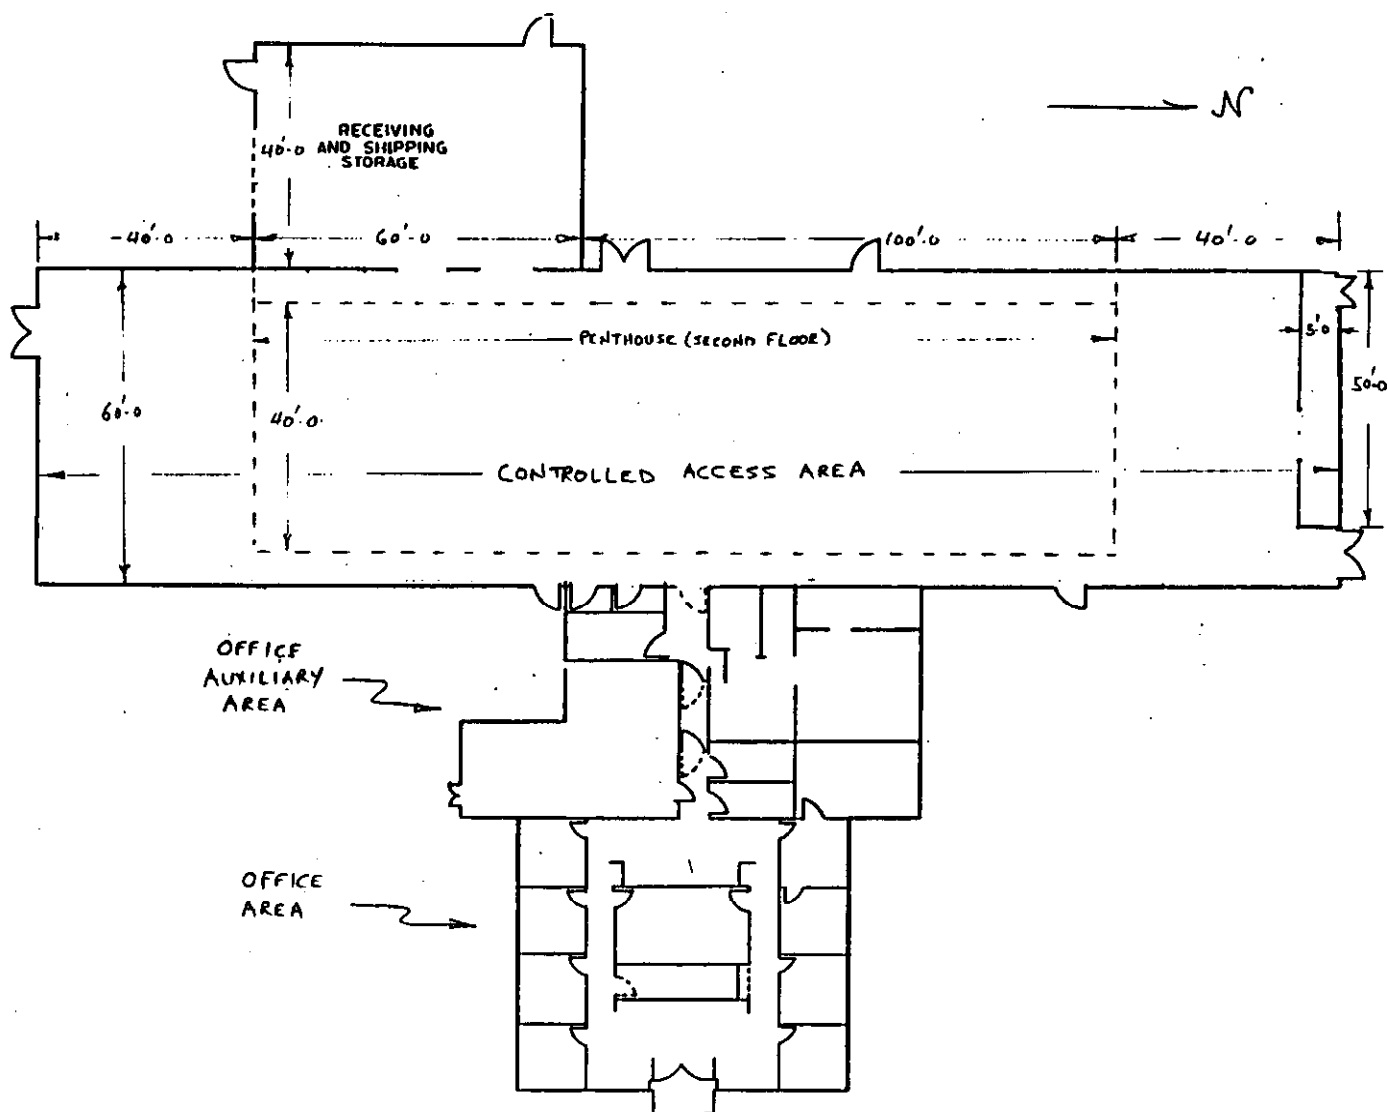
PFDL, Building 8, After Removal of Laboratory Internal Walls
